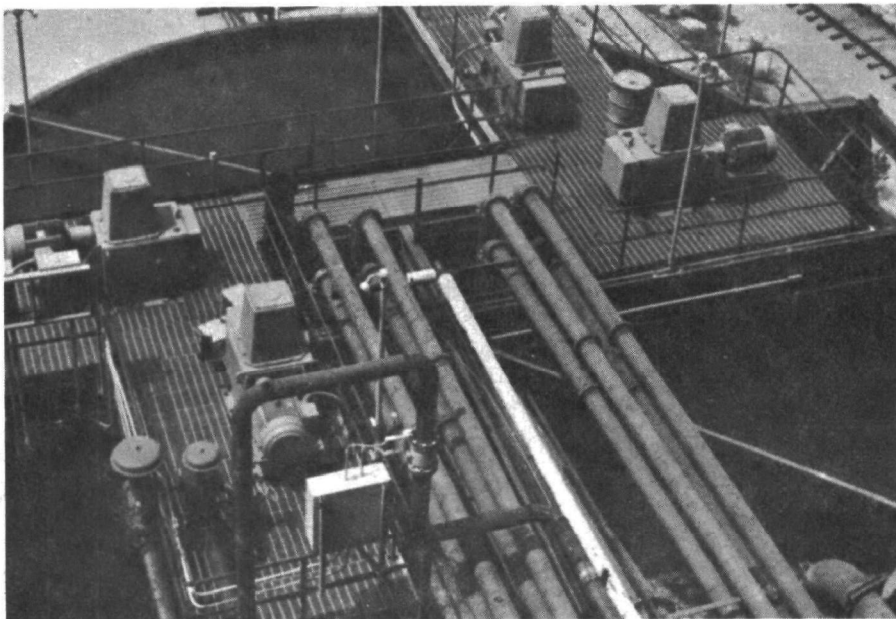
View looking down on the reaction tank at Paddy's Run.
